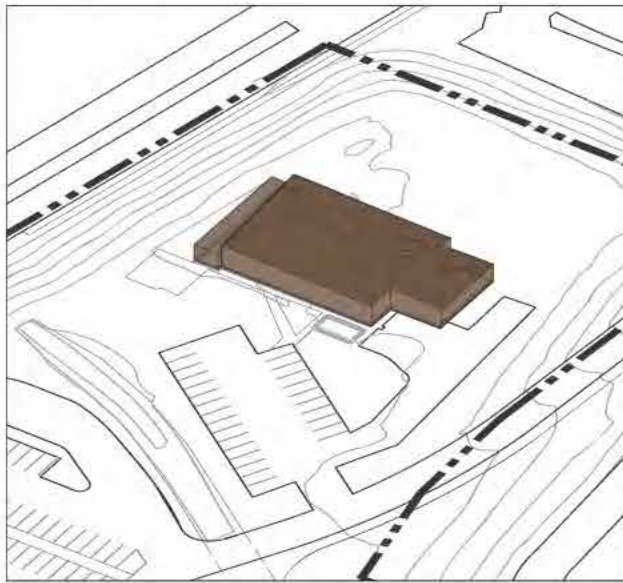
Axonometric and Site Plan of renovated CDC building
